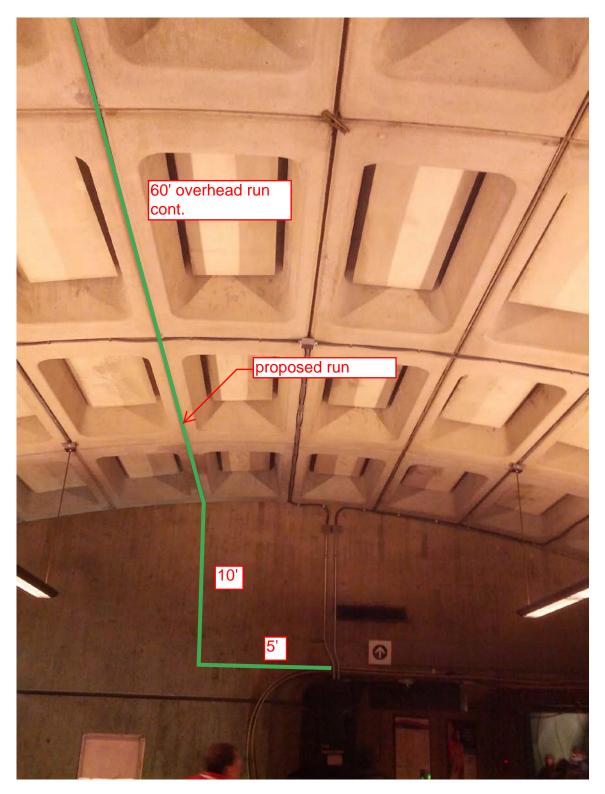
A03 Dupont Circle South: Proposed overhead conduit running into Room #201. Run will need to penetrate metal over door.
